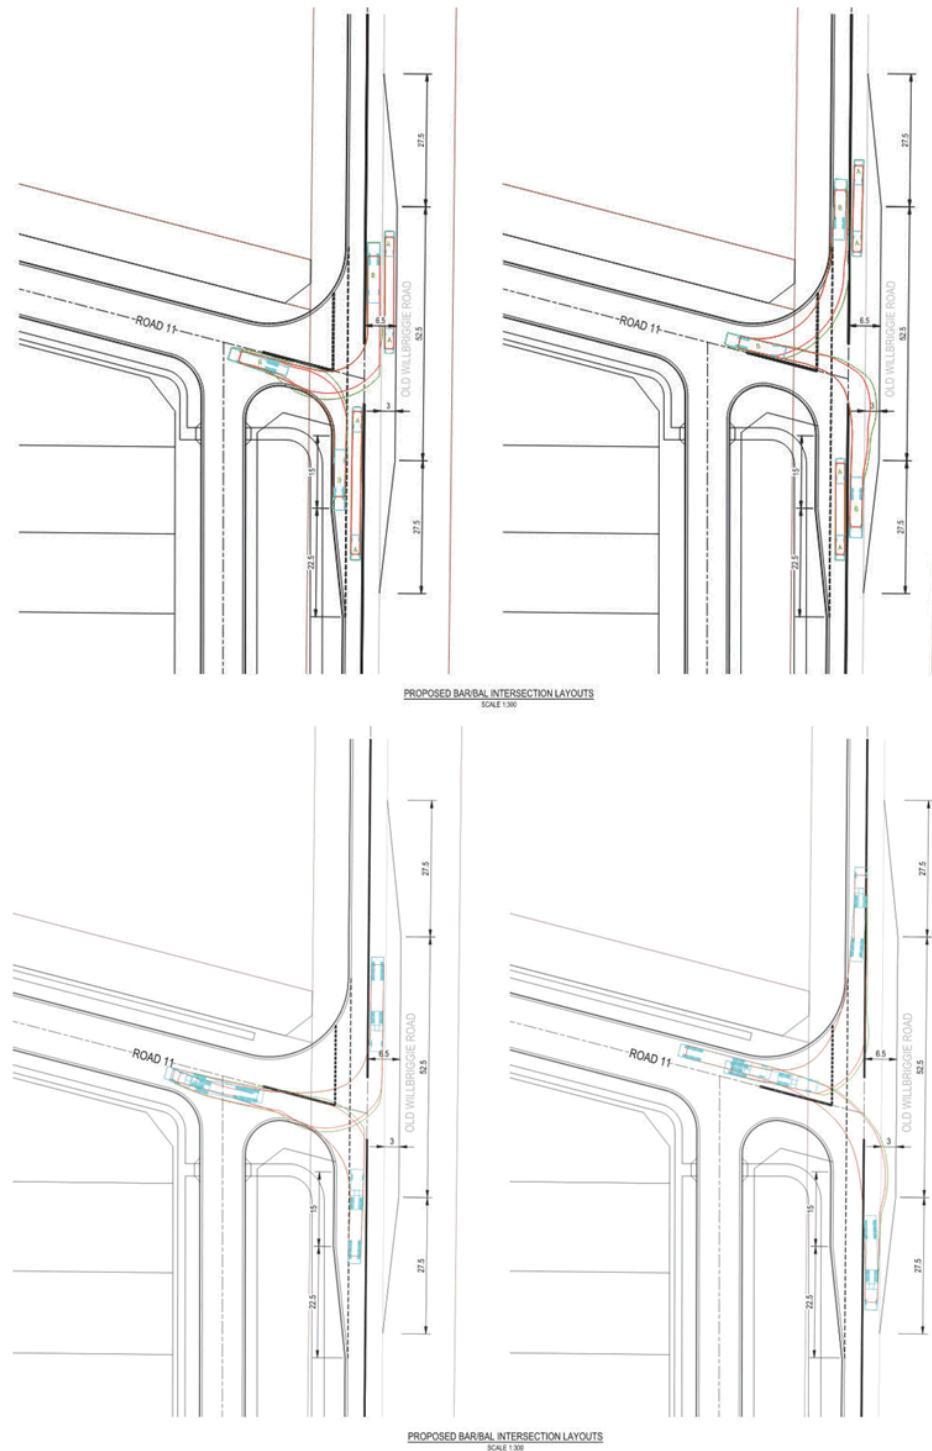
Proposed intersection of Old Willbriggie Road and Road 11 in Stage 2
